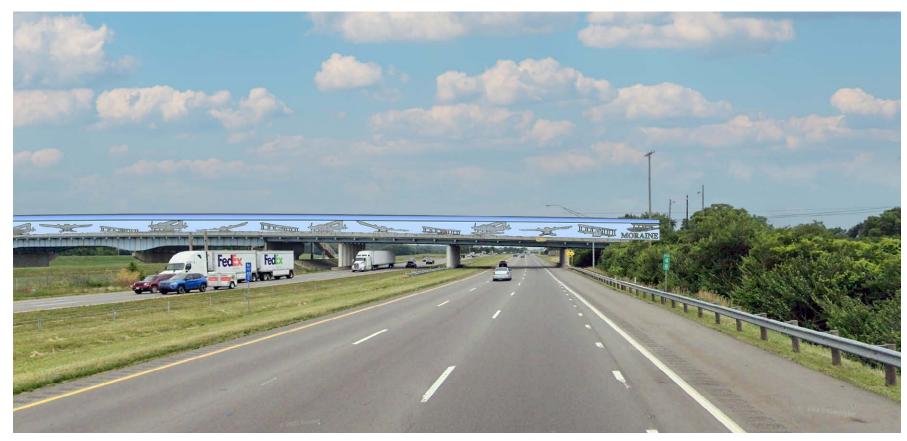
PROPOSED SELLARS BRIDGE CONCEPT LOOKING NORTH FROM I-75.
